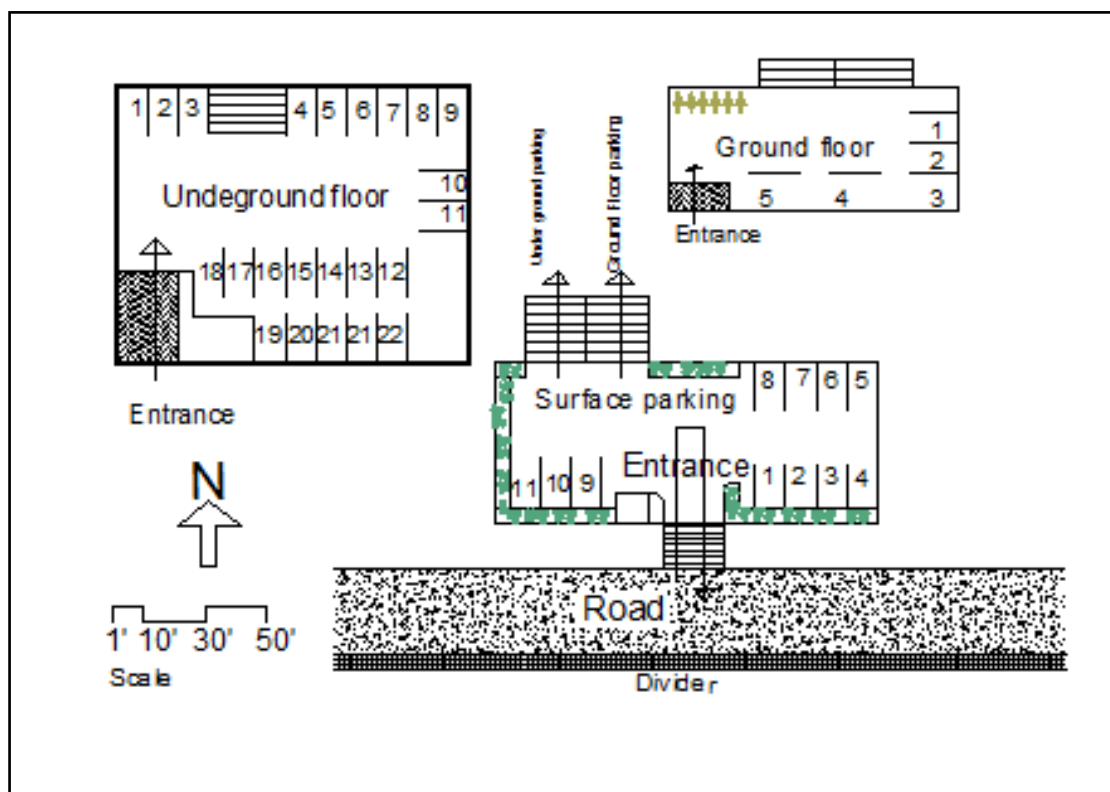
Parking inventory plan of LGED building (Source: Field survey, 2014)
